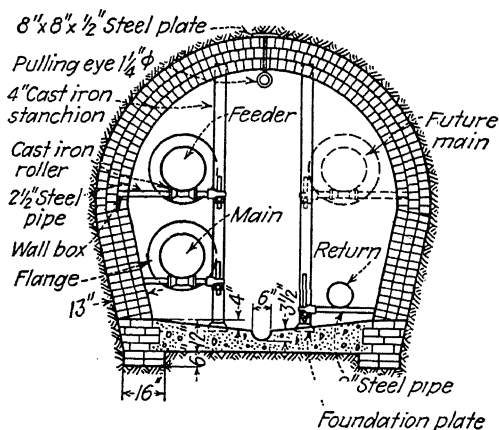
Typical cross section of a deep tunnel where heavy earth loads have to be supported.
